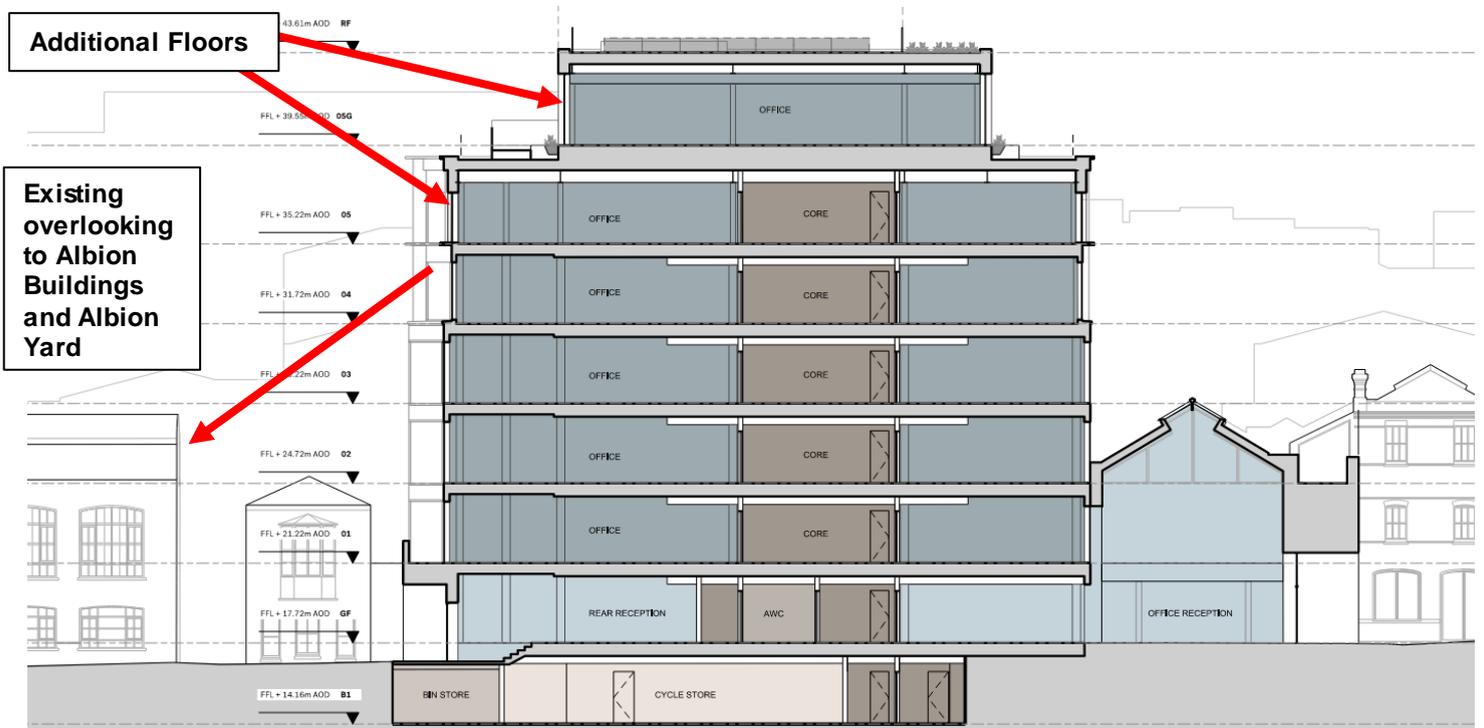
Existing and proposed level of overlooking between Jahn Court and Albion Buildings
